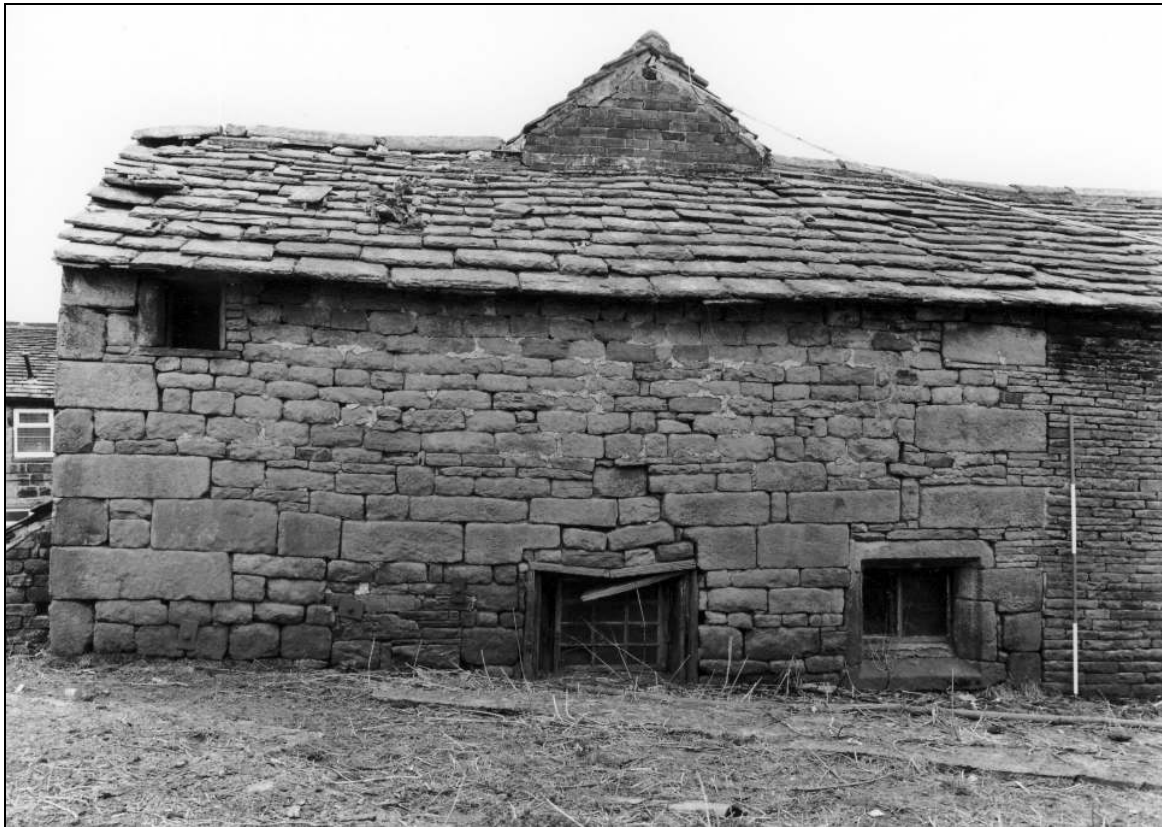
Early wing: north-east elevation (film 1, frame 7)
